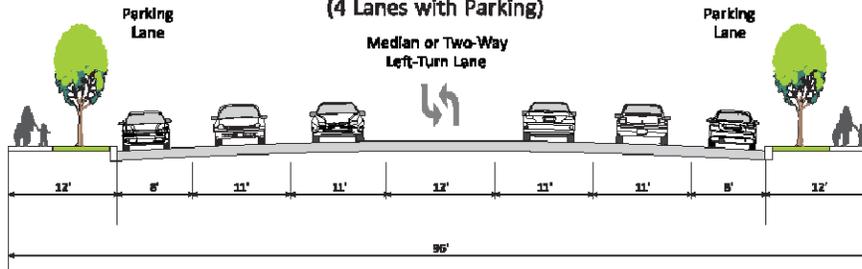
(1 OF 2): CITY OF COLTON GENERAL PLAN CROSS-SECTIONS
